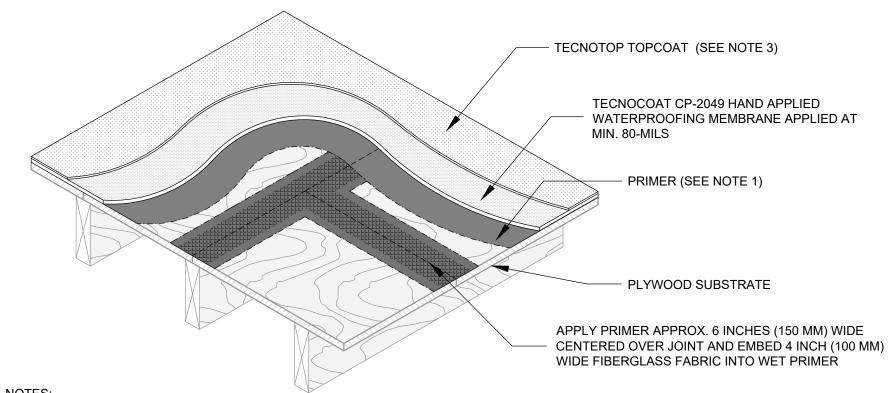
DETAILS ARE INTENDED TO BE A GUIDE FOR WATERPROOFING INSTALLATION ONLY
